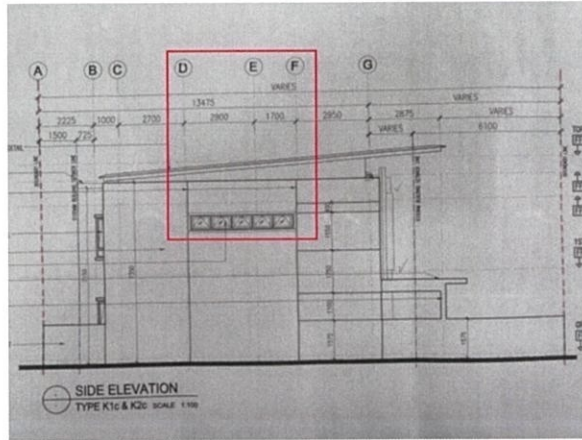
Architectural drawing which has windows at second floor grid line D-F.
